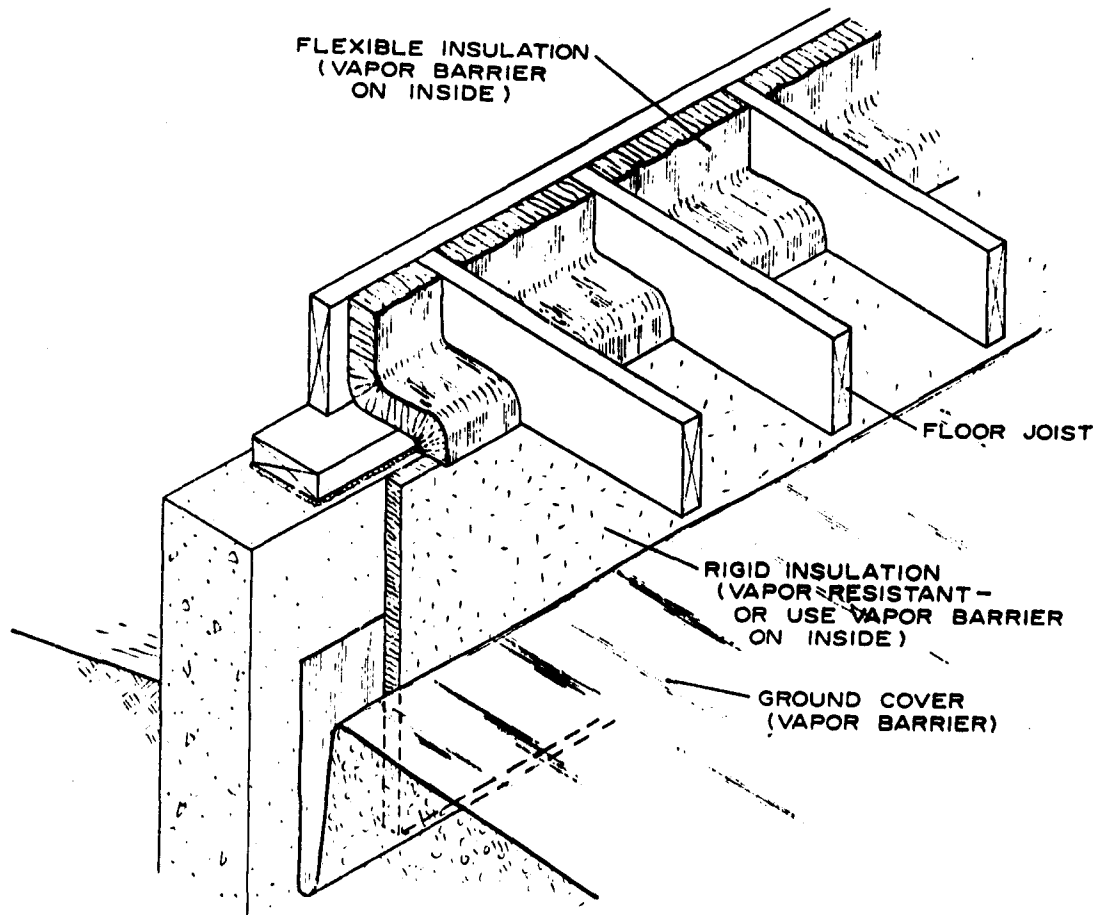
Installation of vapor barrier and insulation in heated crawl space. M 139 239
